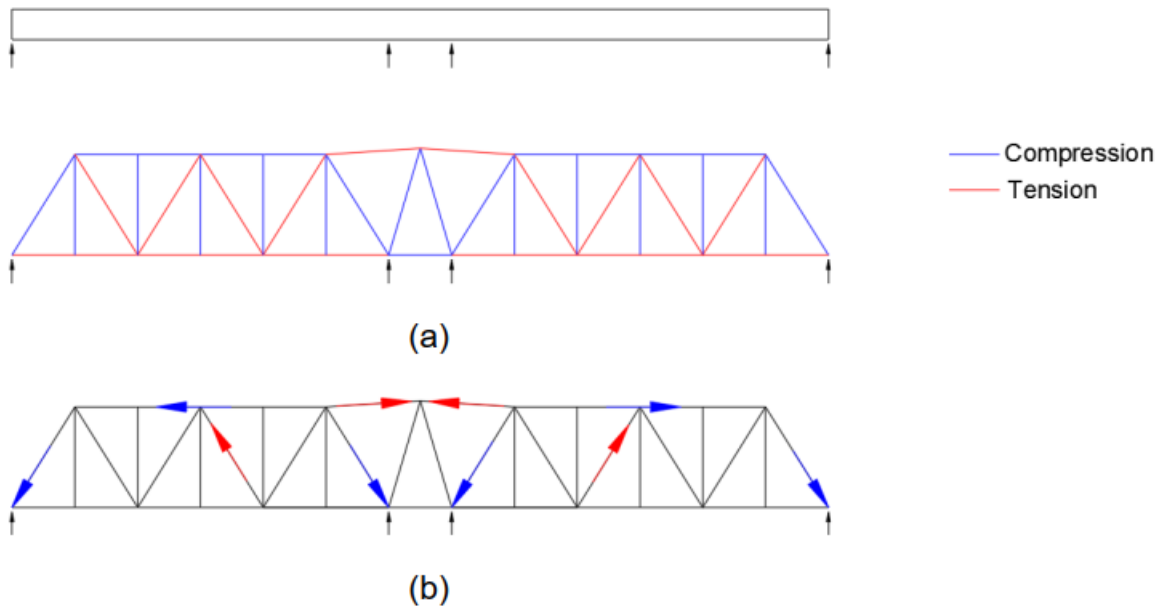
(a) Stresses diagram of rim bearing Swing bridge (b) Load Paths of rim bearing Swing Bridge closed position (not at scale).
